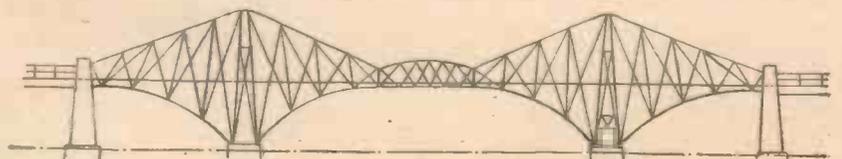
Example of cantilever-cum-girder bridge construction.
